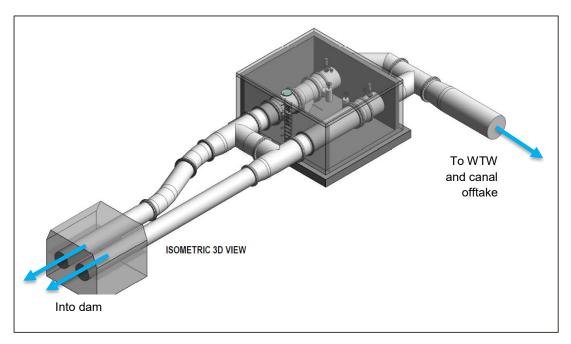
Isometric view of the dam's downstream outlet pipe chamber arrangement
